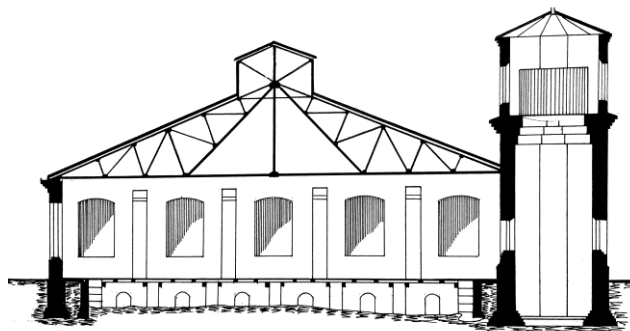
Tashkent tram. Depot. General view, facade and section.
